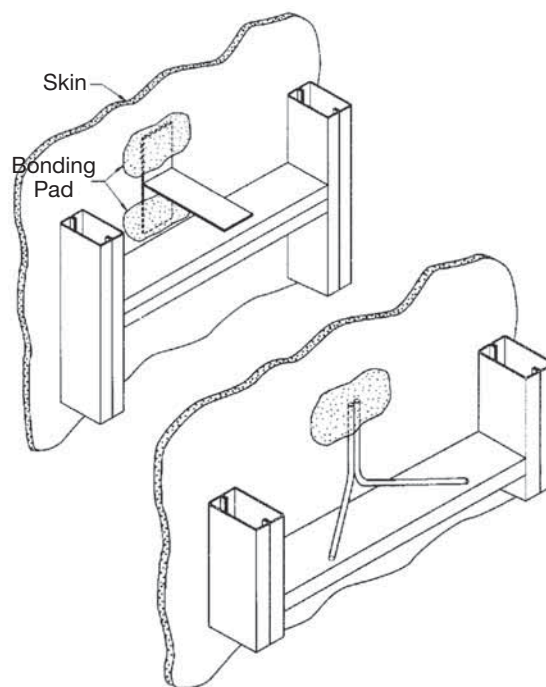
Plate and trussed seismic anchors. (Taken from Glass Fiber Reinforced Concrete Panels, Fourth Edition, PCI. Used with permission, Precast/Prestressed Concrete Institute.)
